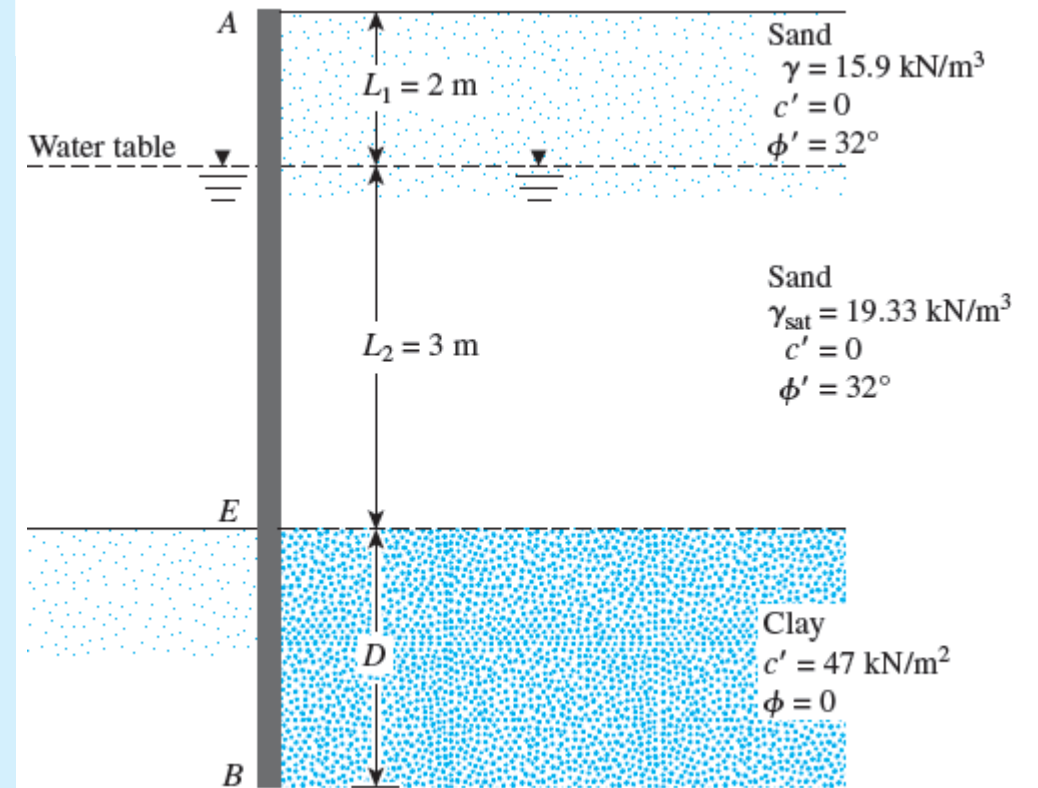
Cantilever sheet pile penetrating into saturated clay
